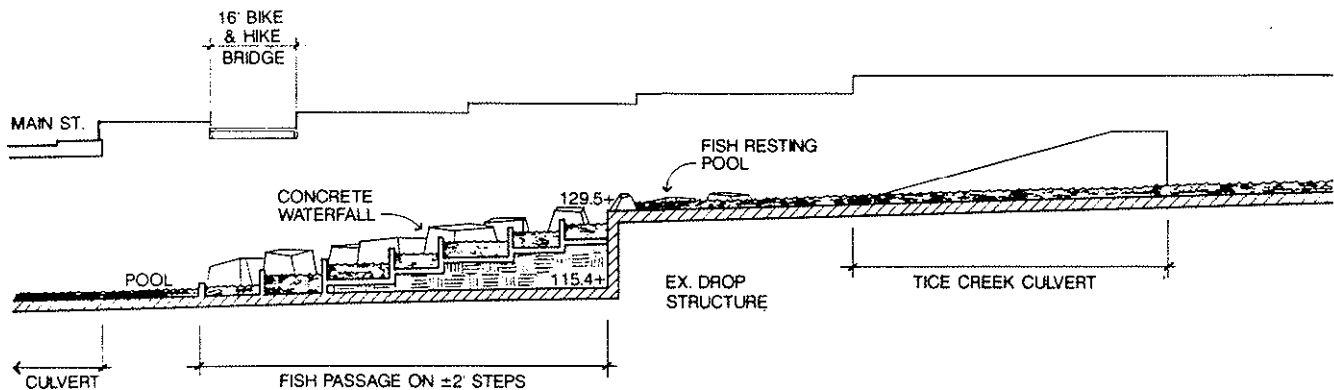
Longitudinal Section at Drop Structure, Looking South
